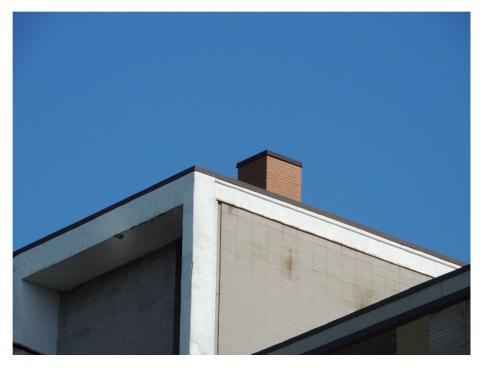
190 Bronson Avenue looking west, chimney capped.
